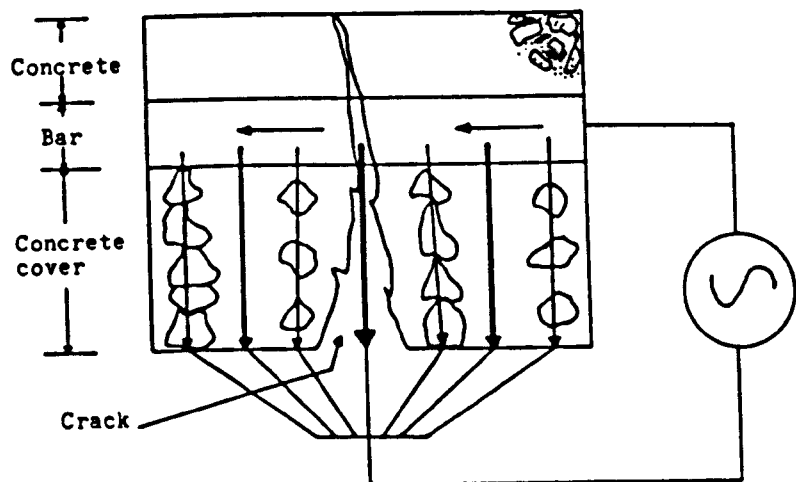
Conducting paths of cracked reinforced concrete.
